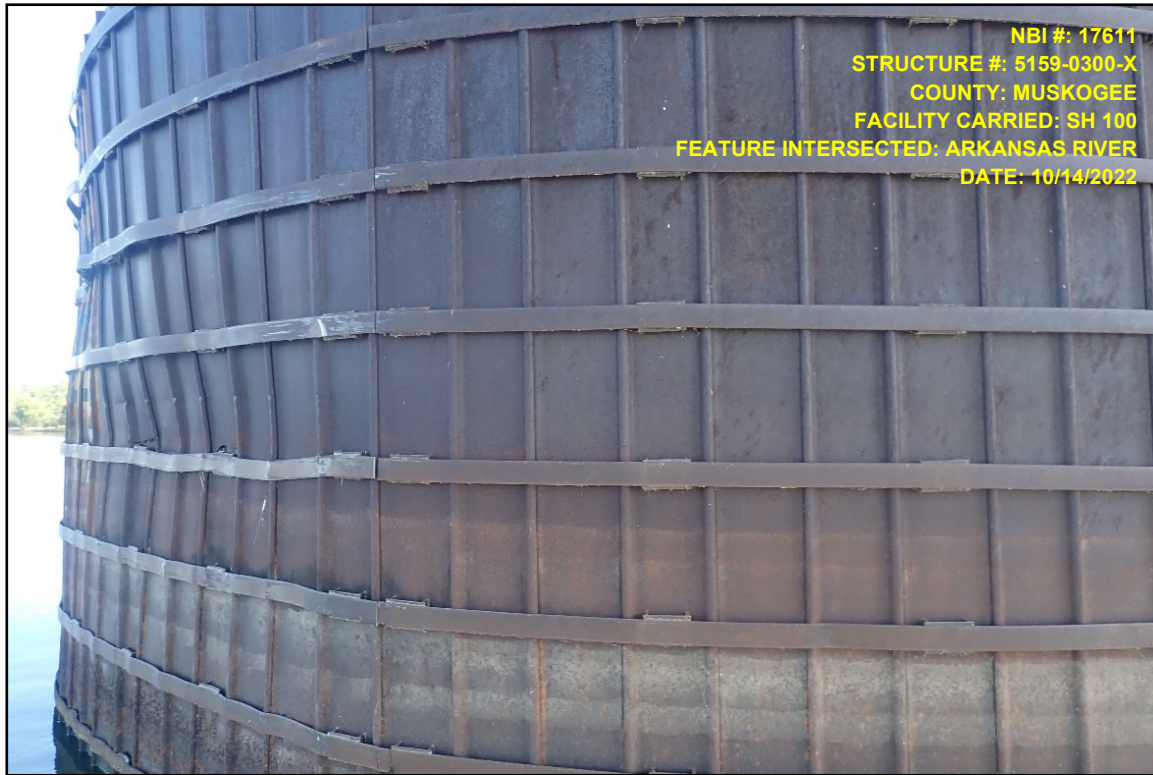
Pier 6 Dolphin, Impact Damage
